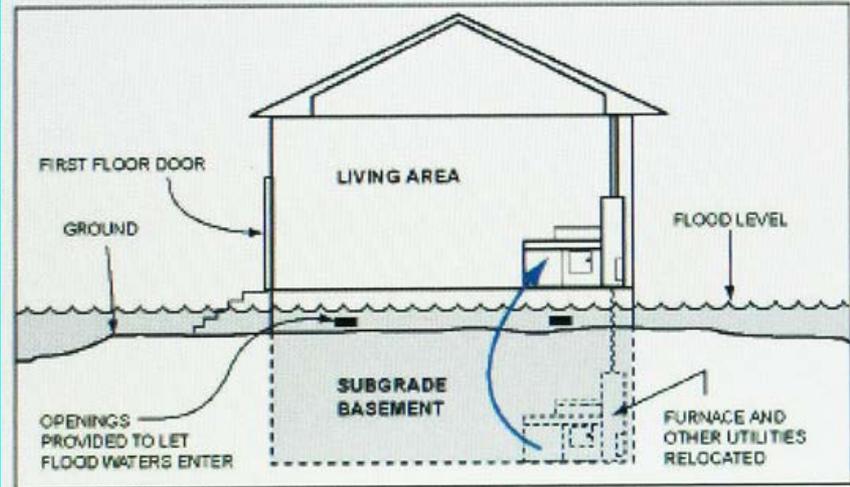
Wet floodproofing with a wet floodproofed subgrade basement
